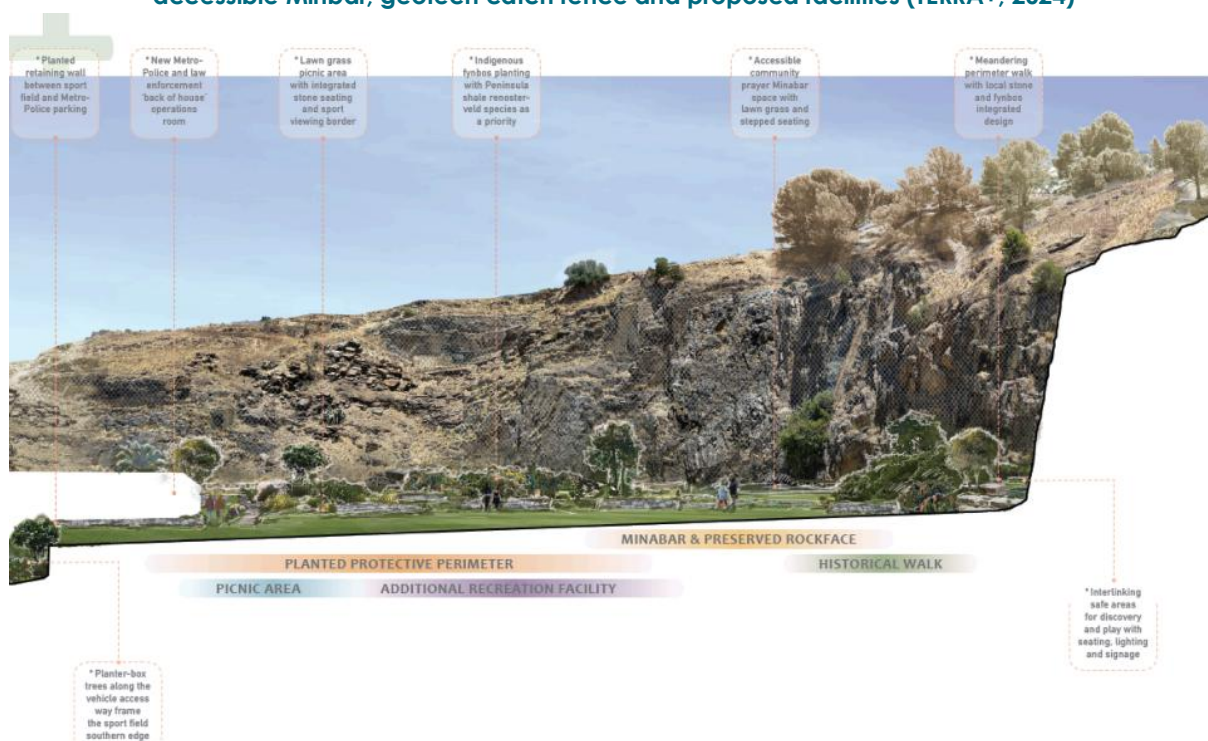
North-south section showing the proposed Heritage Walk with perimeter terracing, hard and soft seating, accessible Minbar, geotechnical rock face solutions (TERRA+, 2024)
